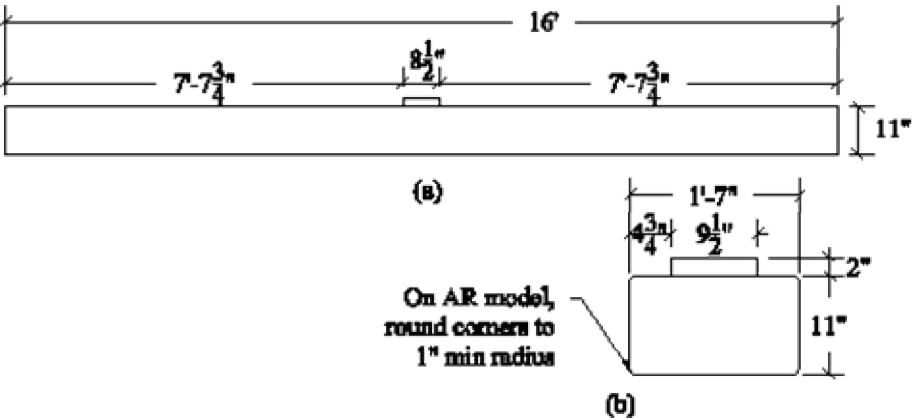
AR and AC specimen geometry: (a) side elevation; (b) end elevation
